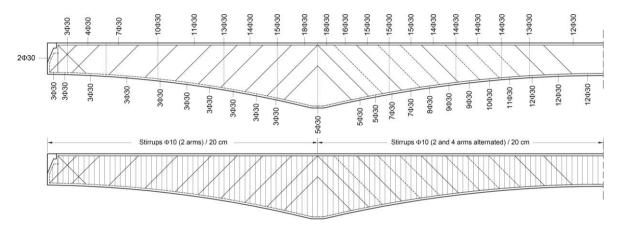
Longitudinal beams rebar arrangement (left half of the bridge span), as reconstructed from the original design report.
